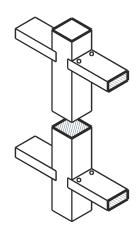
Exterior Connection: Top/Bottom Rail Skew Nailed to Post - 76 mm (3") Nails
